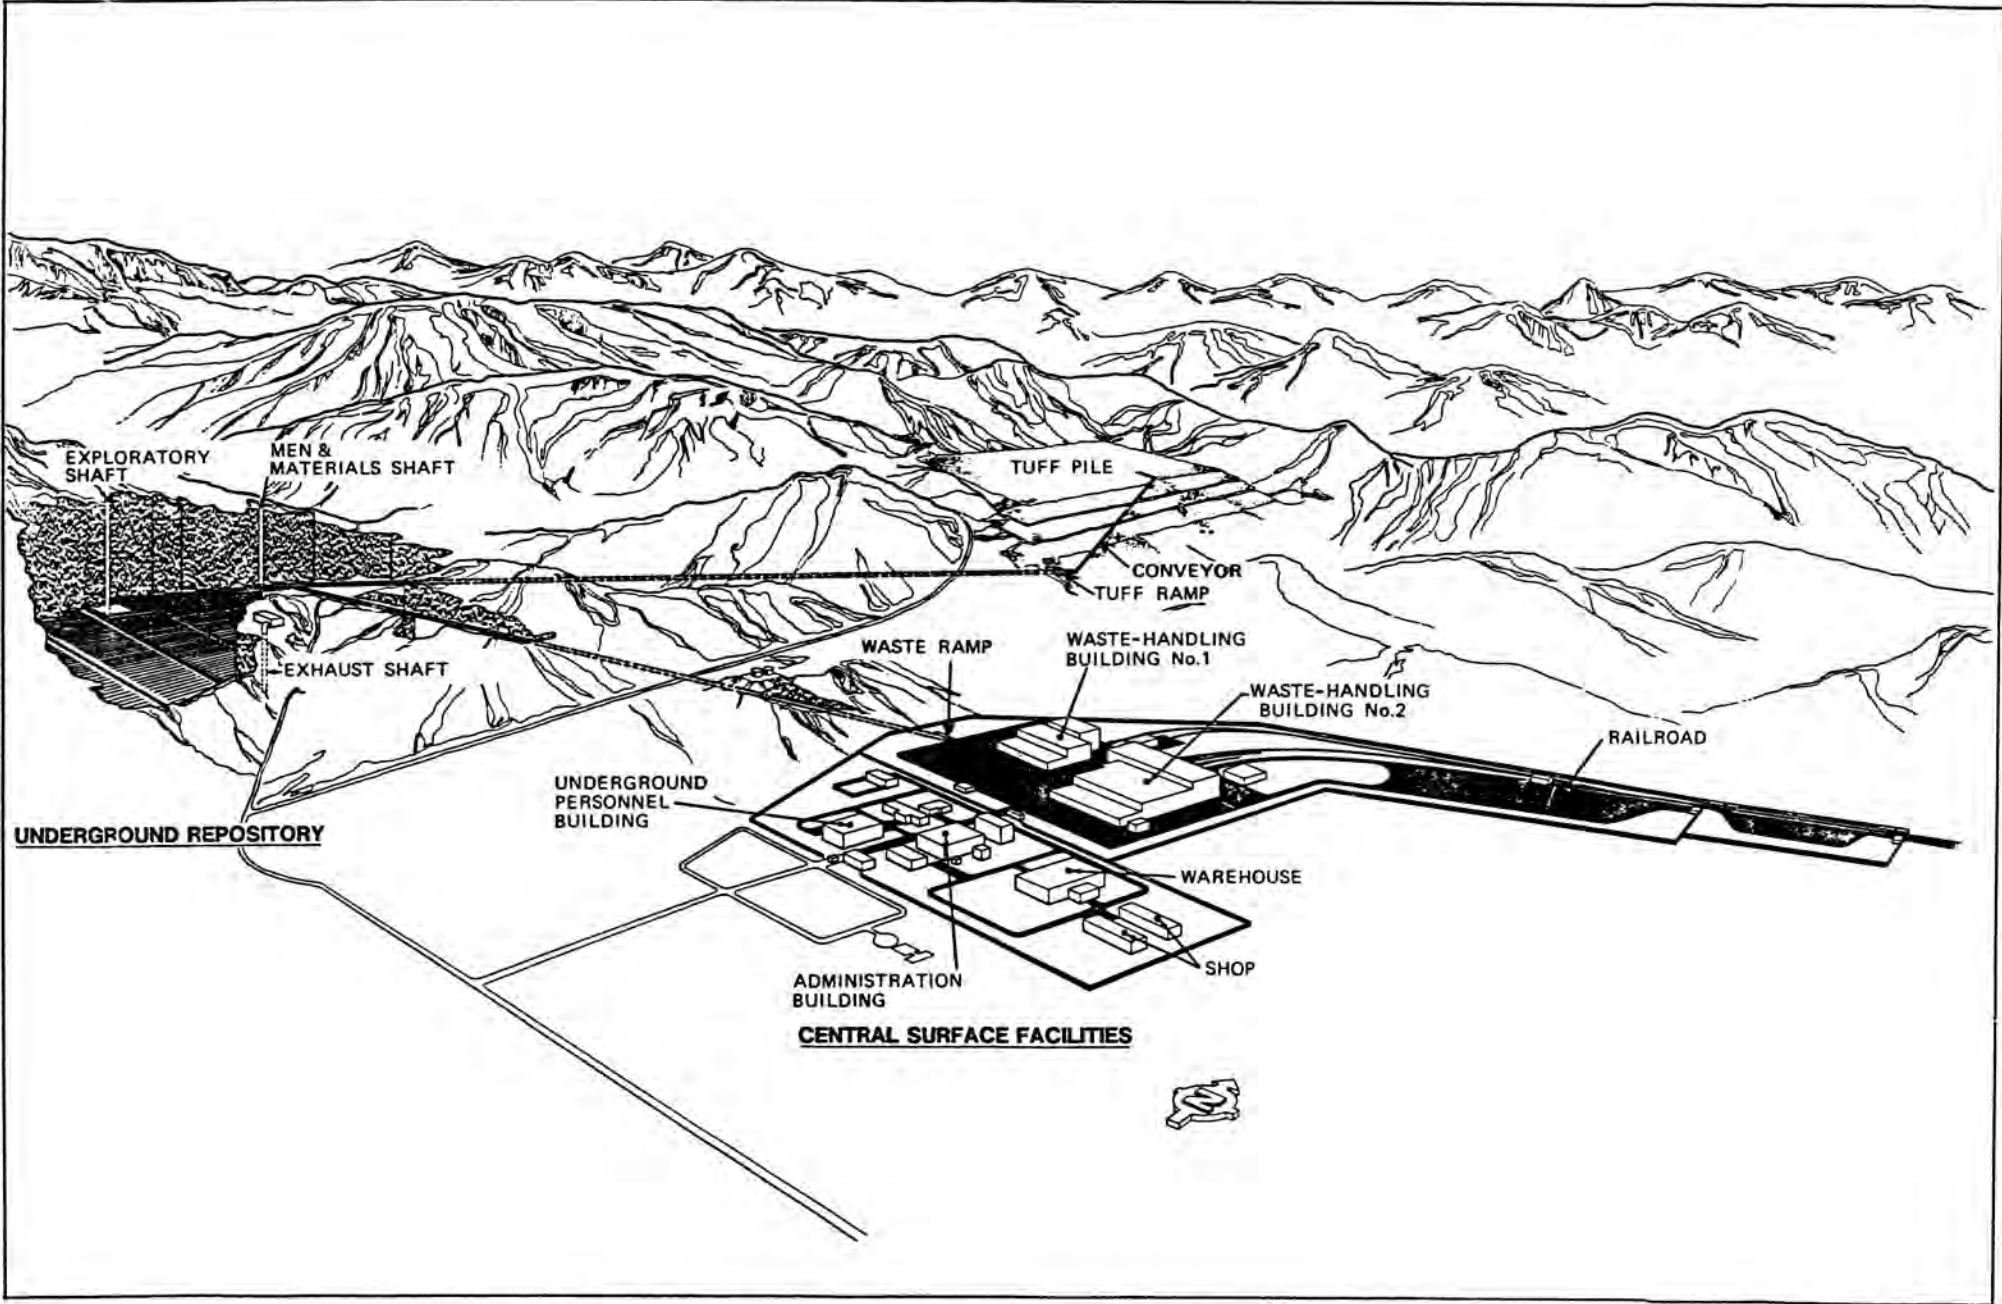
Layout of surface & subsurface facilities for Yucca Mountain site.
